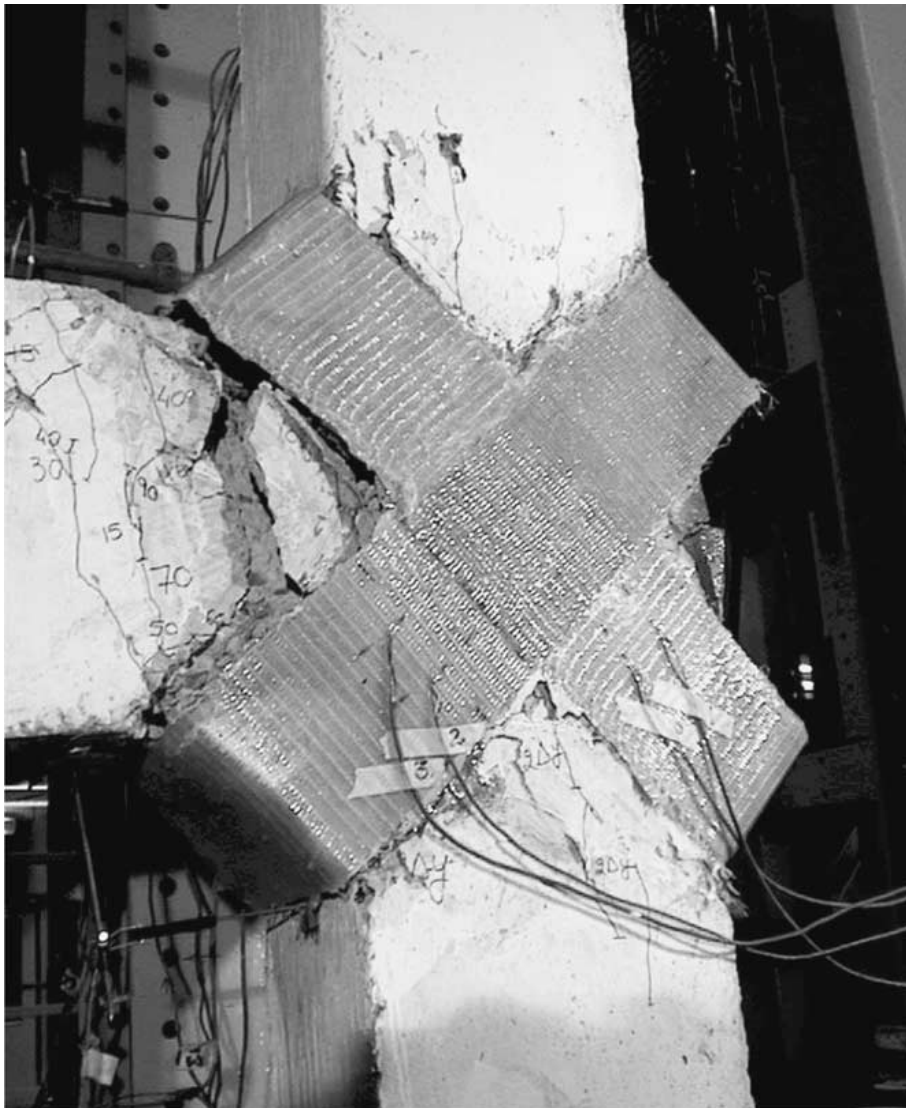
Beam-column joint wrapping techniques (Ghobarah and Said 2001)
